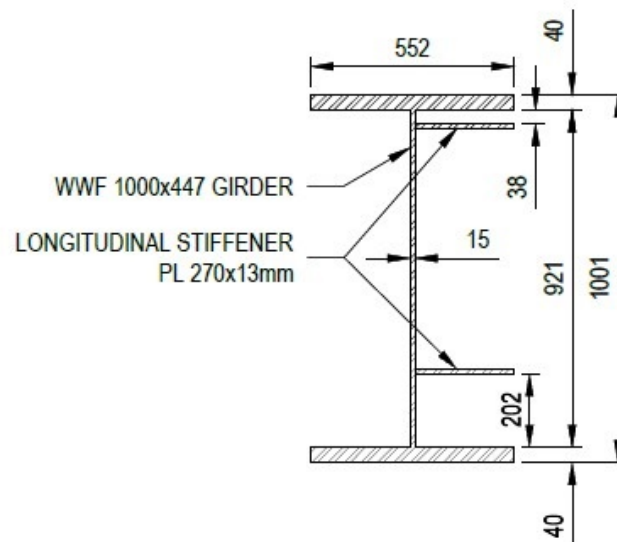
WWF 1000x447 Girder Properties (all dimensions in mm).
